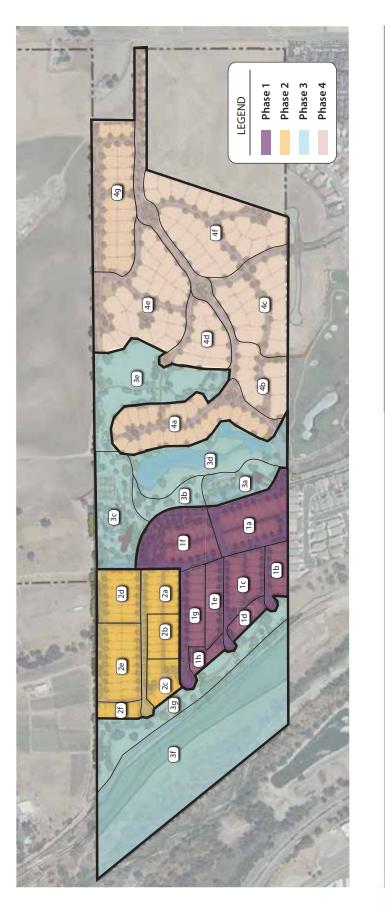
Borkey Area Specific Plan Subarea A Conceptual Site Master Plan
